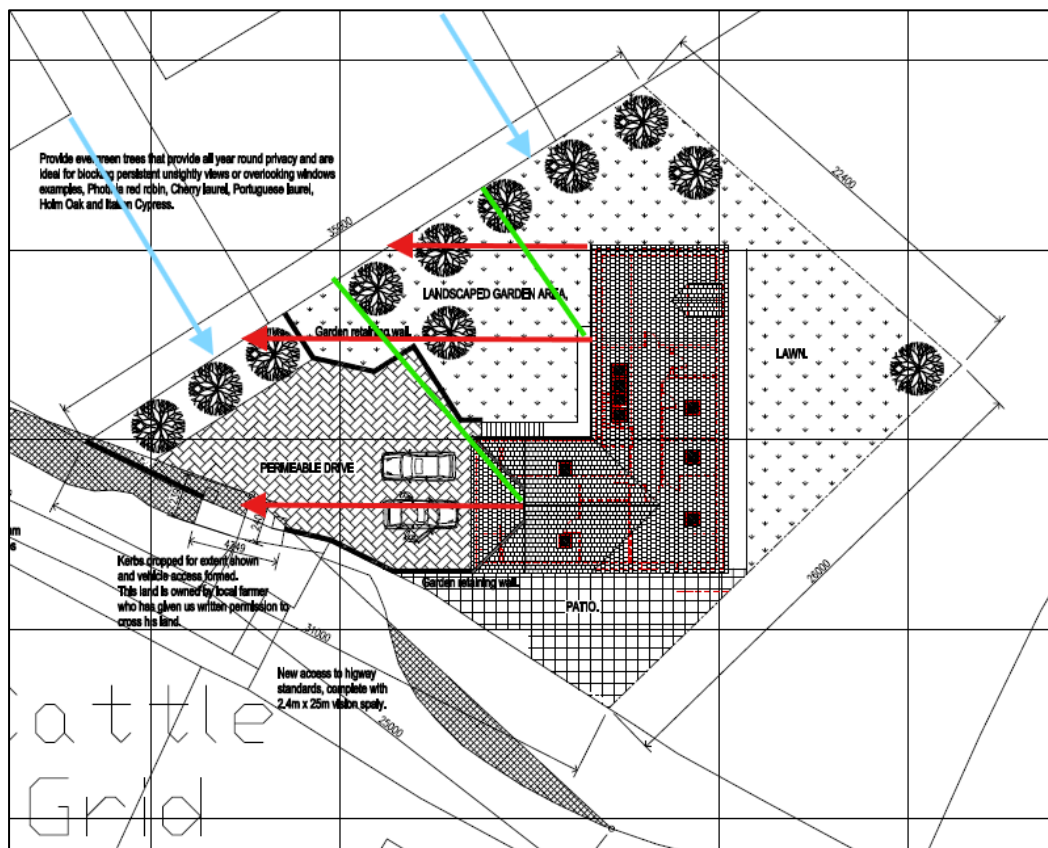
Extract from Site Layout Plan with Distances in Text Below.
